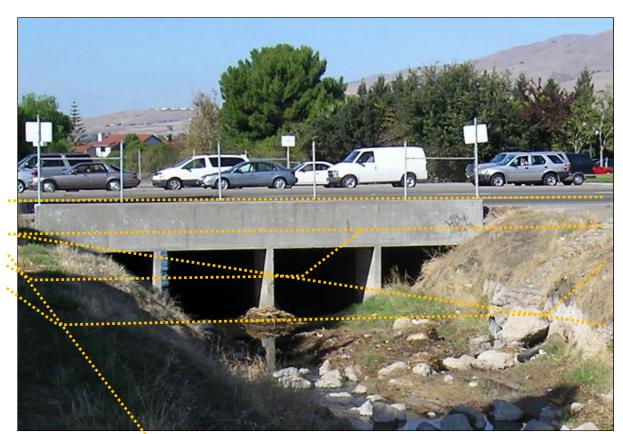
Schematic View of Calaveras Boulevard Bridge Replacement for Alternative 2B/d
